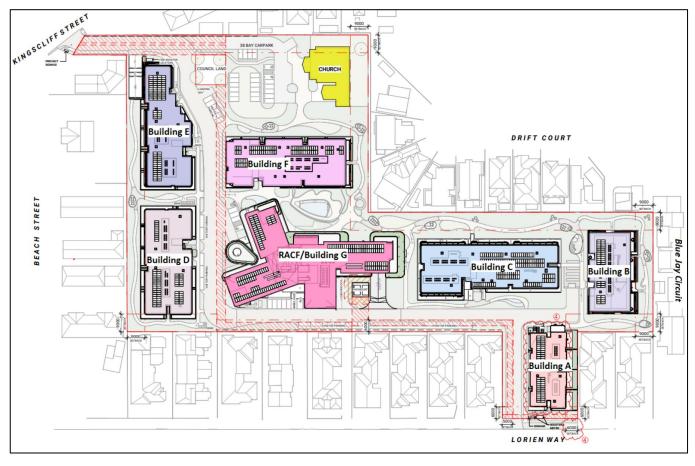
| Proposed site layout (Base source: Applicant's RFI)
